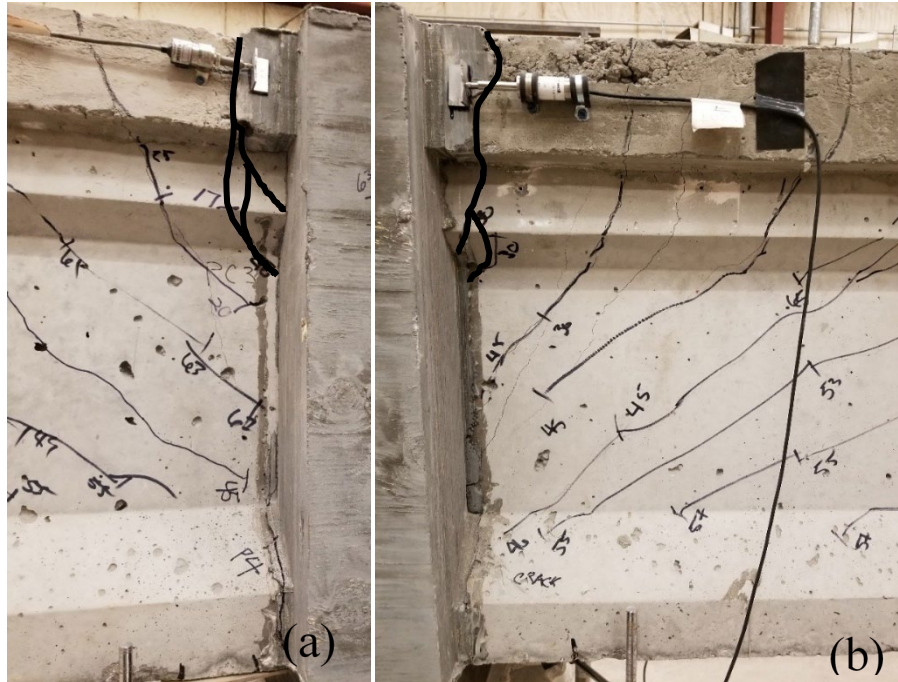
Joint separation at the interface between the RC3-N concrete deck and the UHPC joint with the flexural crack going vertically down in the girder (a) and joint separation at the joint interface between the RC3-S concrete deck and the UHPC joint with the flexural crack going vertically down into the girder (b) are indicated by dark lines.
